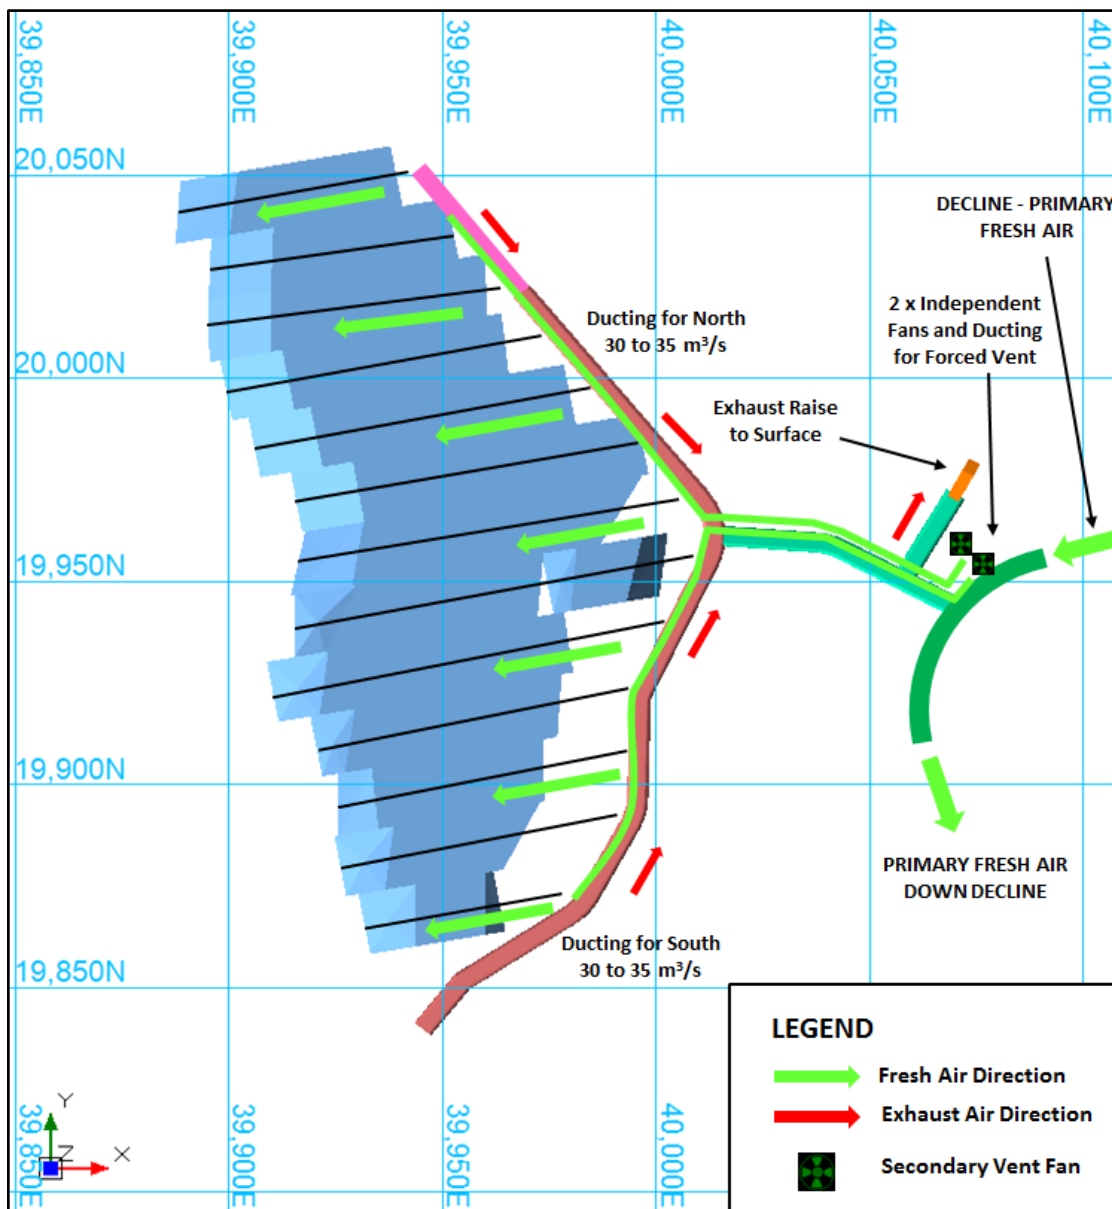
Plan view 861mRL level in Area 1 – secondary ventilation
